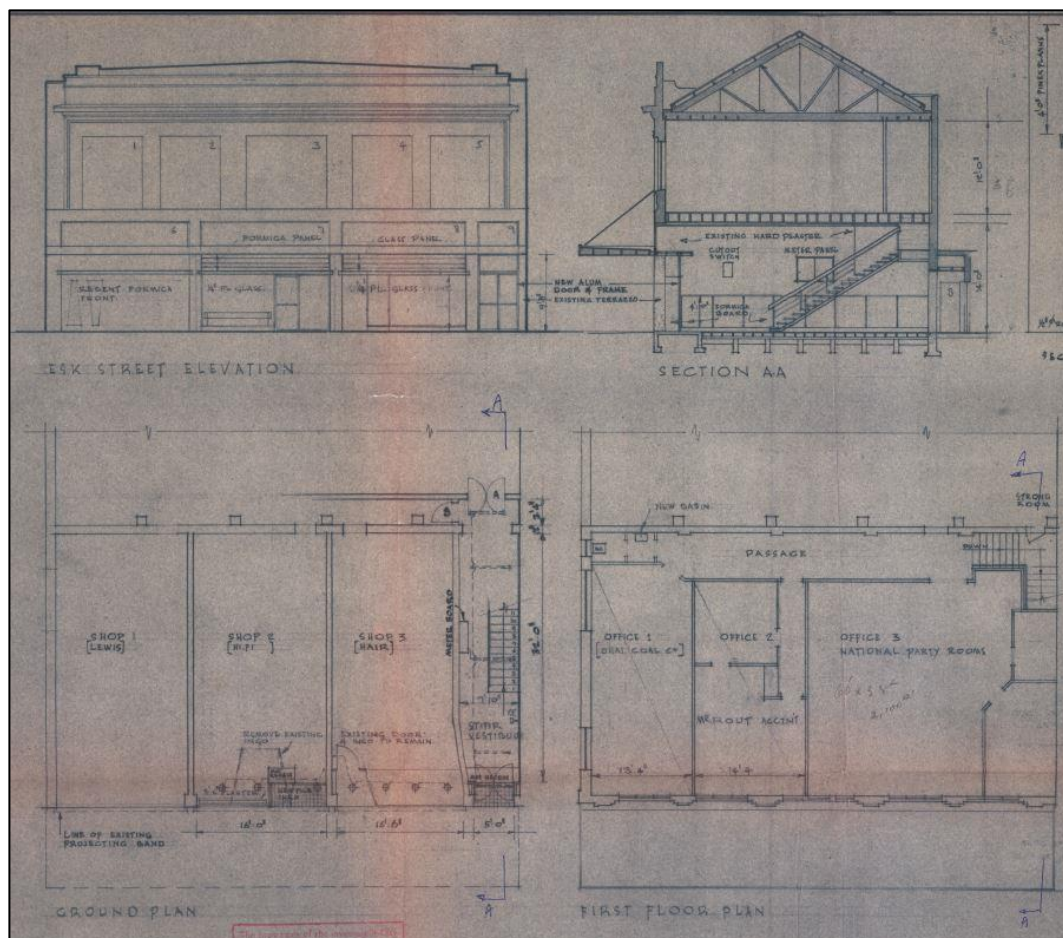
Detail from 1965 plan showing plans and elevations of Nichol's Building (Smith, Rice, Lawrence, & Mollison, 1965).
